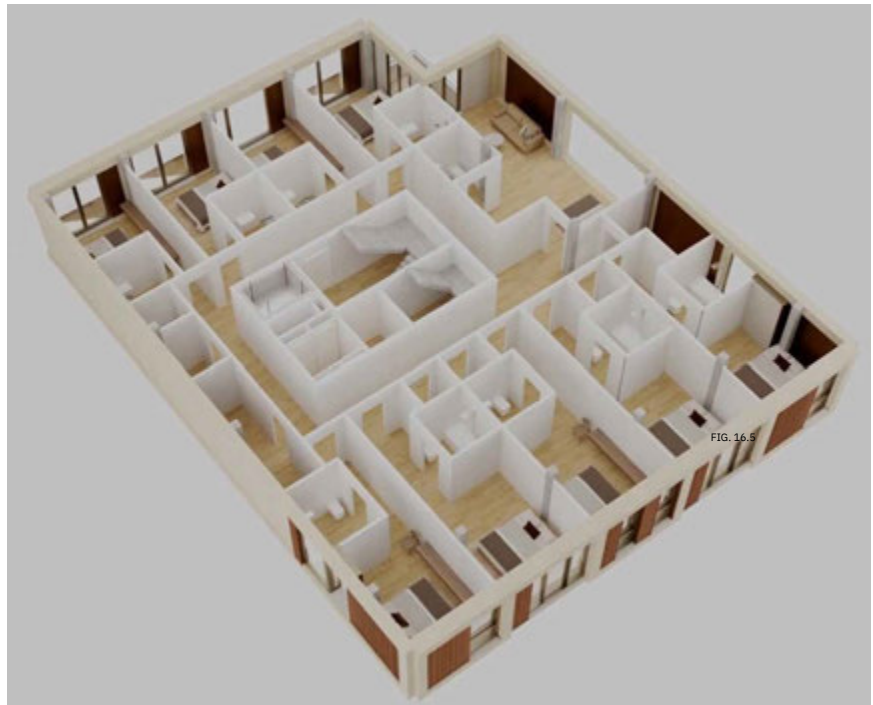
A 3D rendering of the floor plan of an office in The Hague that has been transformed into a mixed-use residential building
